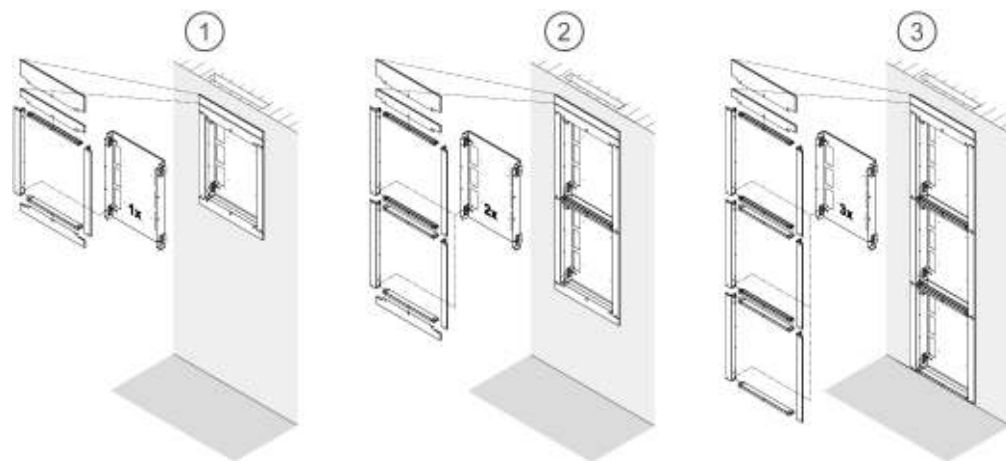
Flush mounting frame set installation with 1, 2 or 3 frames
